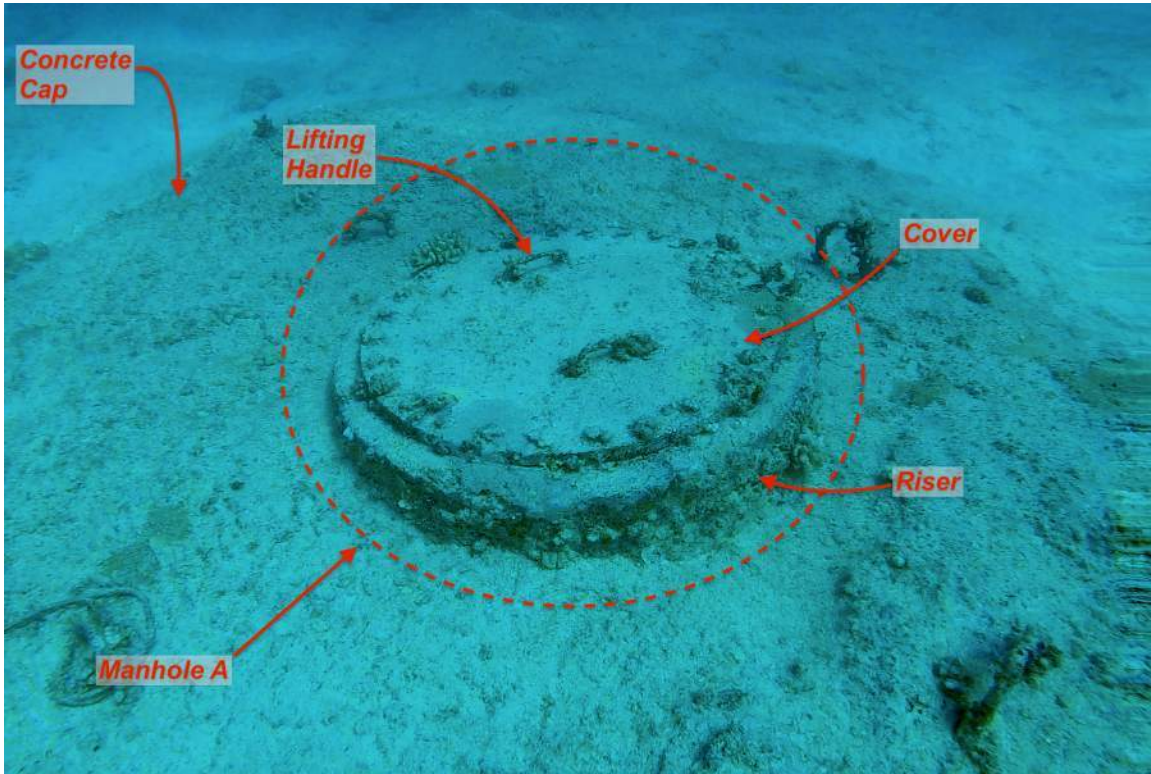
Manhole A, shallowest manhole on the 42-inch extension
